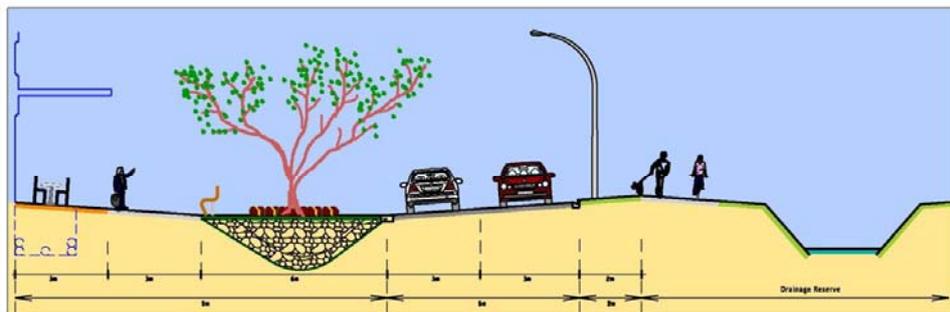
Local Road Cross-Section (20 m Wide Corridor)
